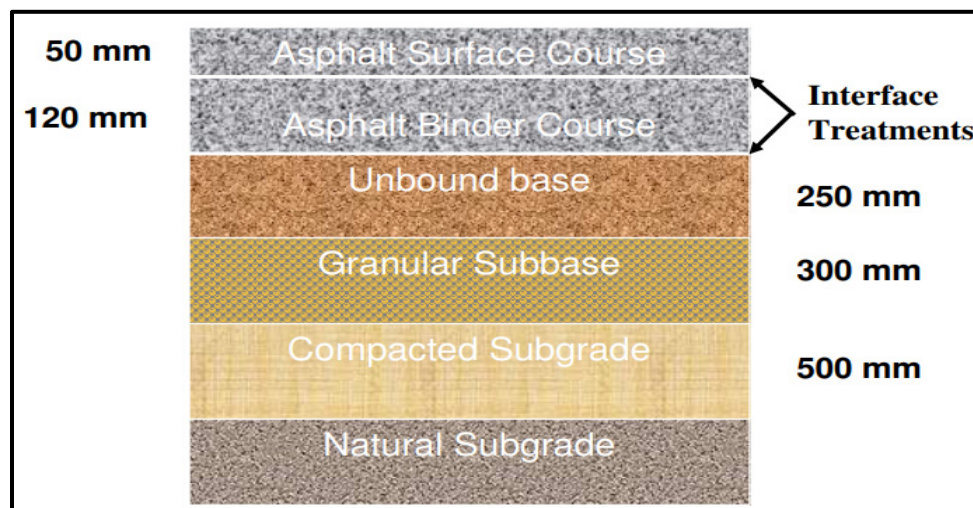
4 Cross section of a typical ACP Taken from Jenks et al. (2011)
